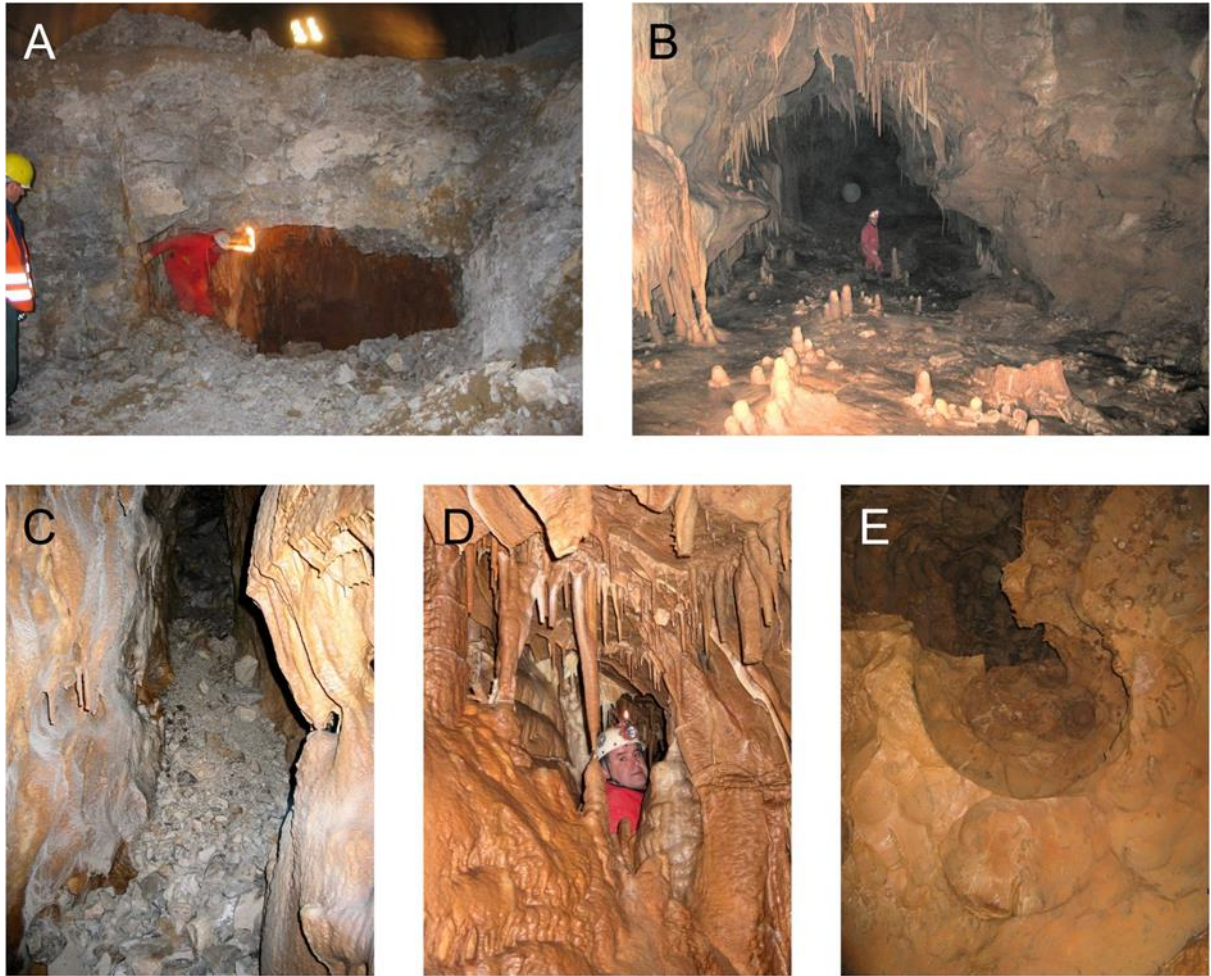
Typical intersections of tunnel pipes with cave tunnels. (A) Intersection of tunnel with cave S640 opened only at the front of the staircase, which is significantly more probable from the point of view of rock collapse than in the excavation phase of the dome (photo: F. Drole). (B) Cross section of a typical oblique pit of large dimensions developed in phreatic conditions along the tongue (photo: J. Hajna). (C) The outflow of crushed rock from the northern tunnel pipe to a depth of 45 m was evident only from the final naturally preserved part of cave S 640, which was more or less accidentally reached through the southern tunnel pipe (Figure 7A; photo: F. Drole) . (D) The dimensionally large S 640 cave is so narrowed in several places due to sediments in it that it does not give the impression of a more important cave (photo: J. Hajna). (E) It is difficult to determine the hydrological environment from a short section of the cave tunnel - the ceiling shapes would indicate epiphreatic conditions if the same cave did not continue into a buried tunnel with crystal sigo, which unequivocally proves a vadose hydrological zone (photo: F. Drole).
